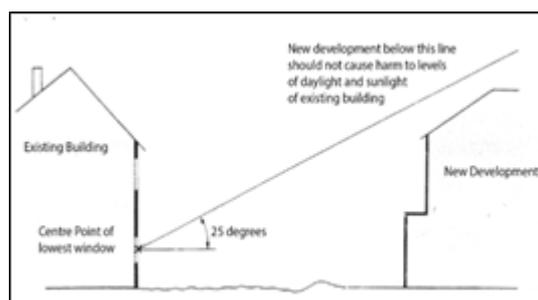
Section in plane perpendicular to the affected window wall from existing to proposed development showing acceptable application.
